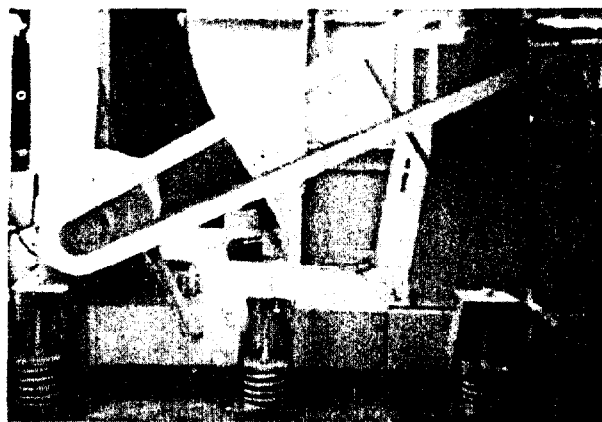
Inertial mounting for fan and motor in building exhaust system of a transuranium laboratory facility.
